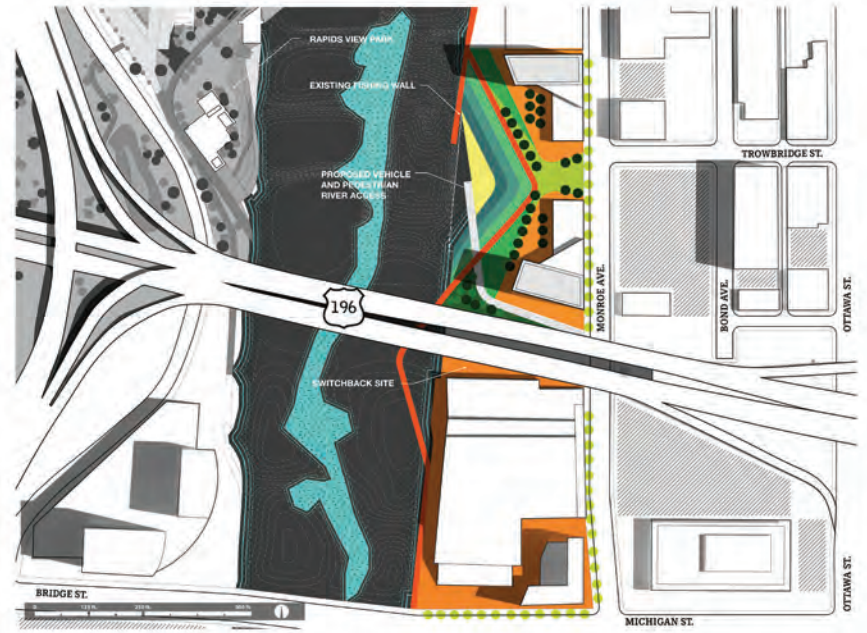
Proposed MSU / City / KC site plan - Alternate 2
